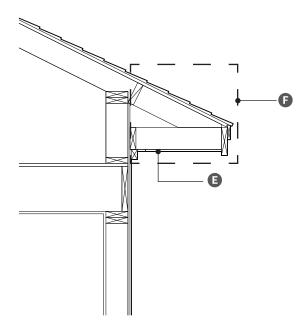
E Section detail of Highest Top Plate for pitched roof.
